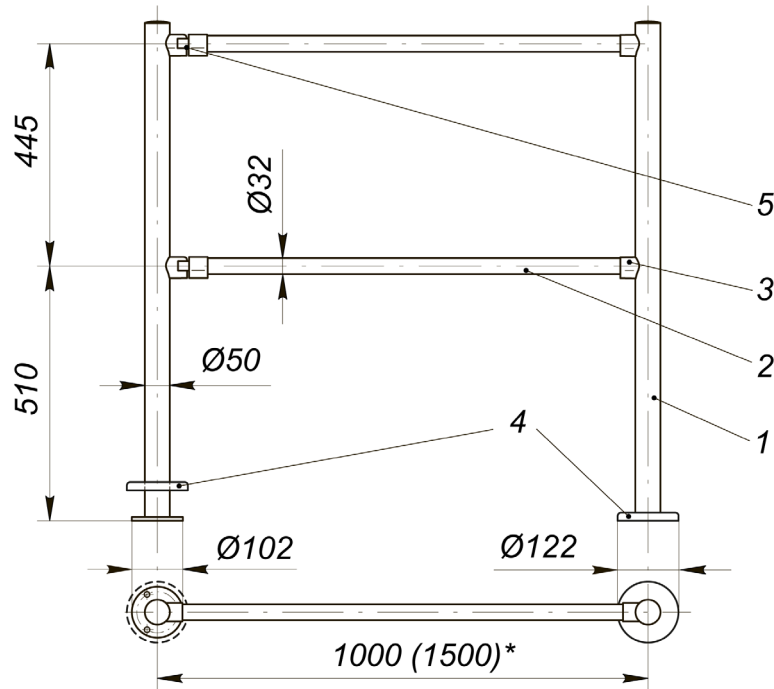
Stationary railing section without filler panel and with adjustable coupling fittings¹:
